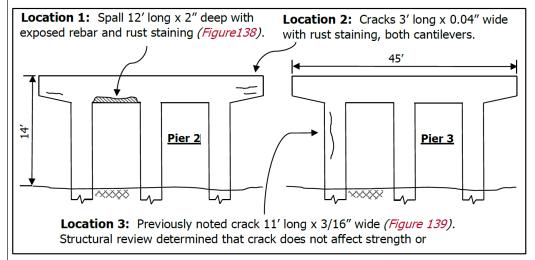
Elevation view of two concrete column piers showing substructure defect locations.
